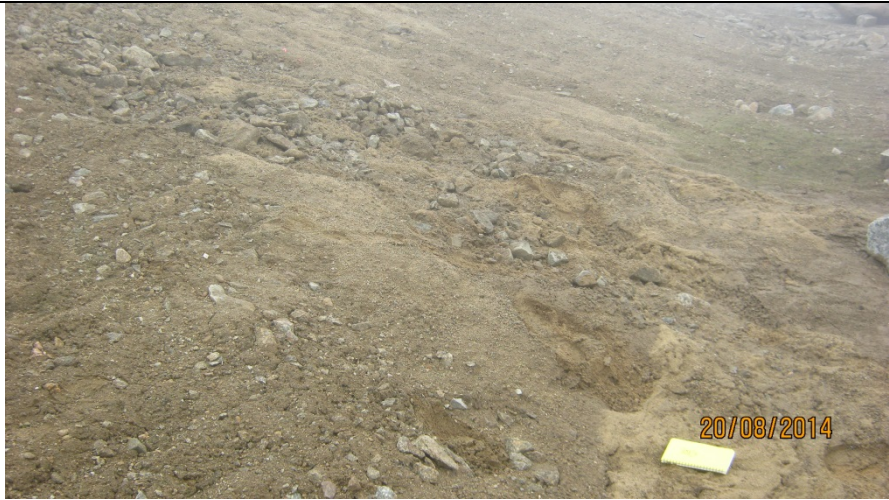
(FOX-5 SA P-1.jpg)	Photo 2 (FOX-5 SA P-2.jpg)
